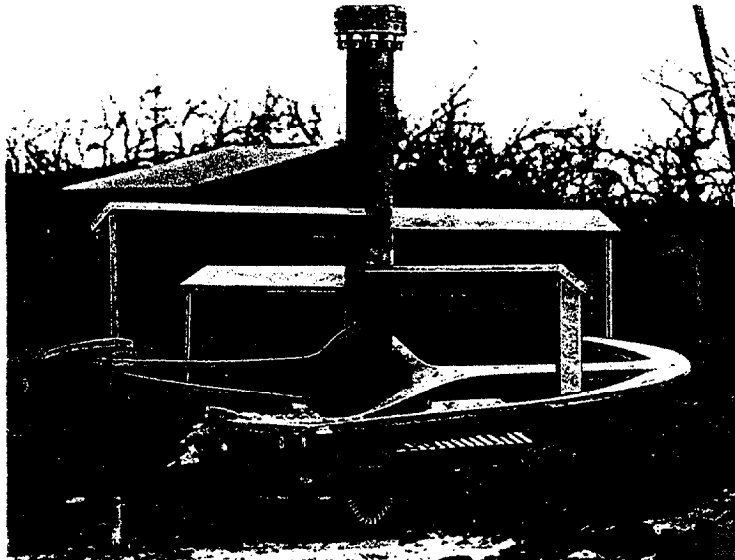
Shallow Soil Mixing (SSM) method principles and equipment (Geo-Con, Inc., 1990).
